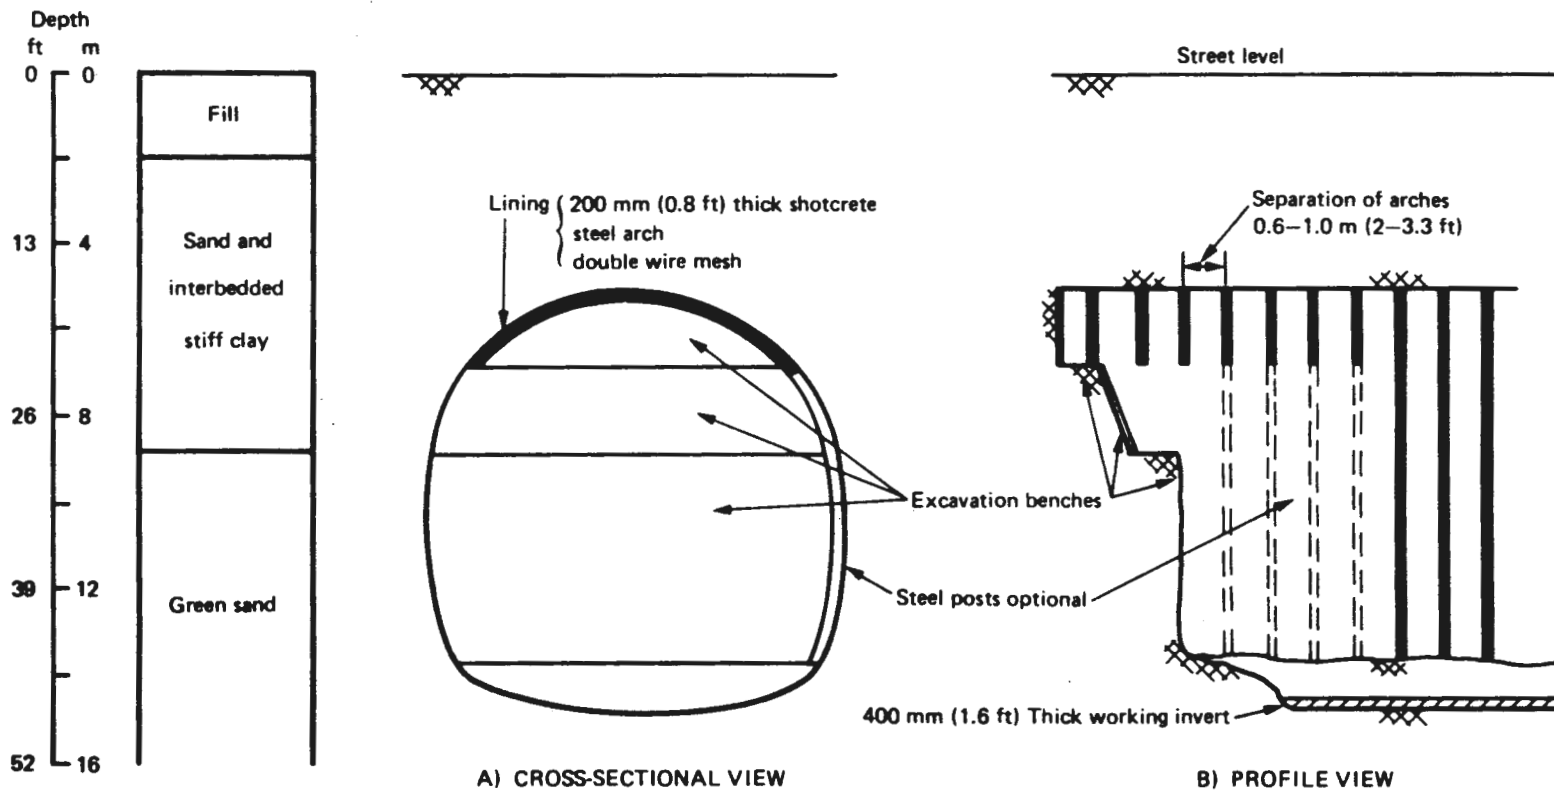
Transverse and Longitudinal Profiles of Tunneling for the Bochum Metro
